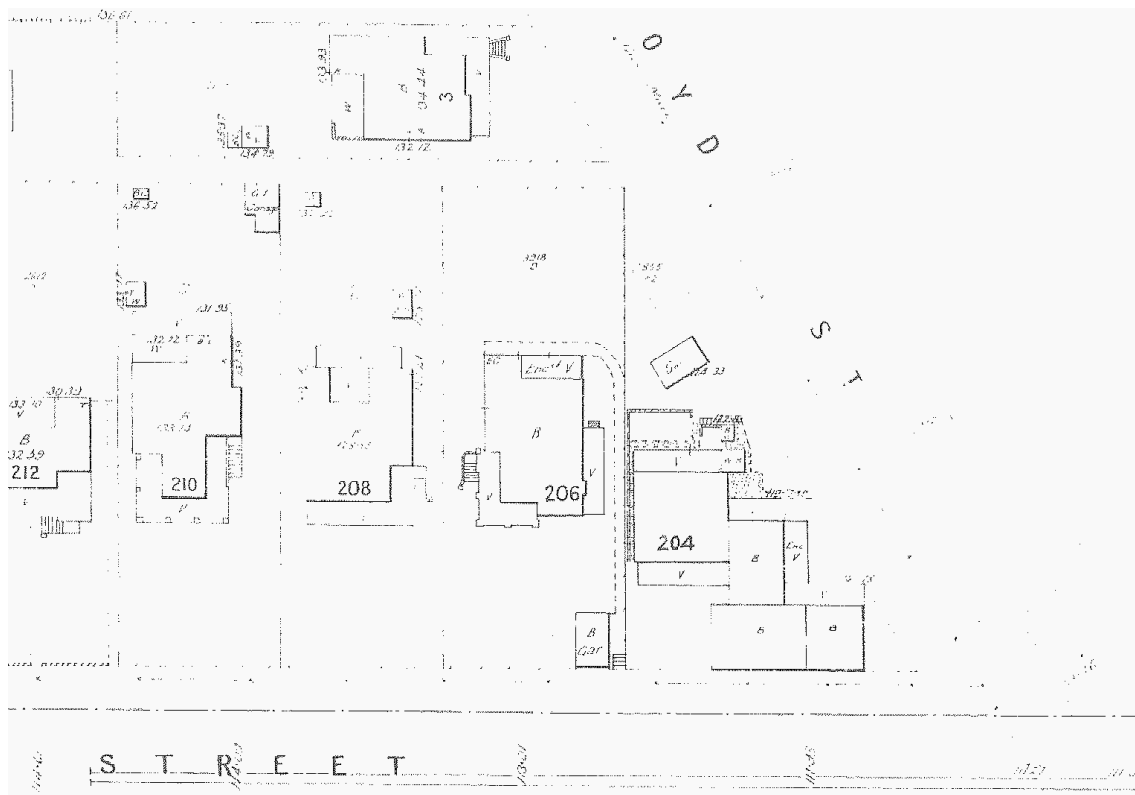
Extract from Metropolitan Sewerage Plan Sheet 236 (source: State Records Office, 1924 revised 1961, retrieved 2013)
